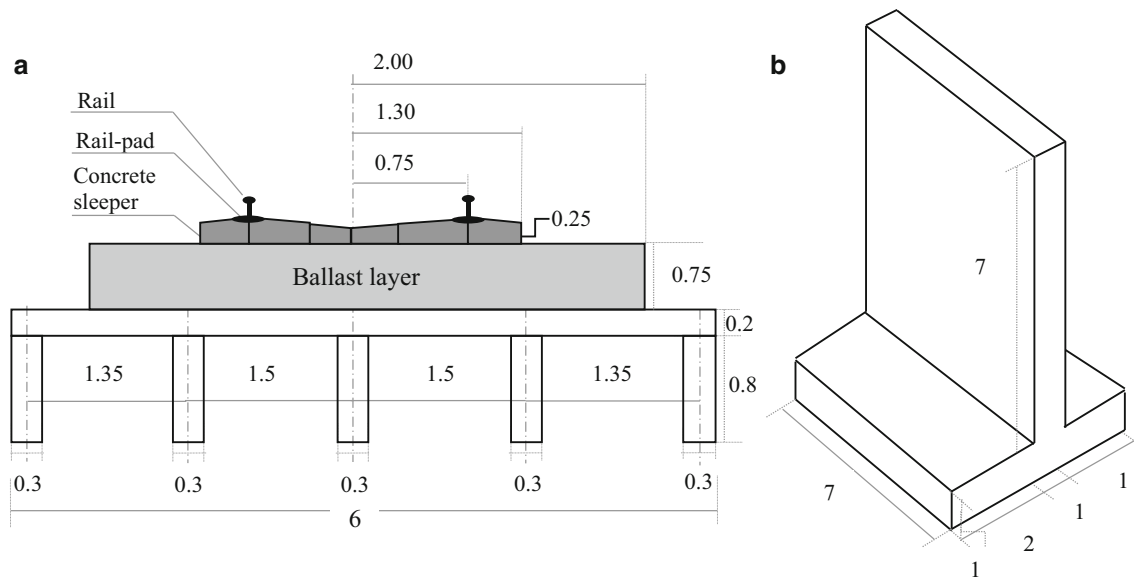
a Cross section of bridge deck. b Abutment dimensions. All dimensions are in metres
